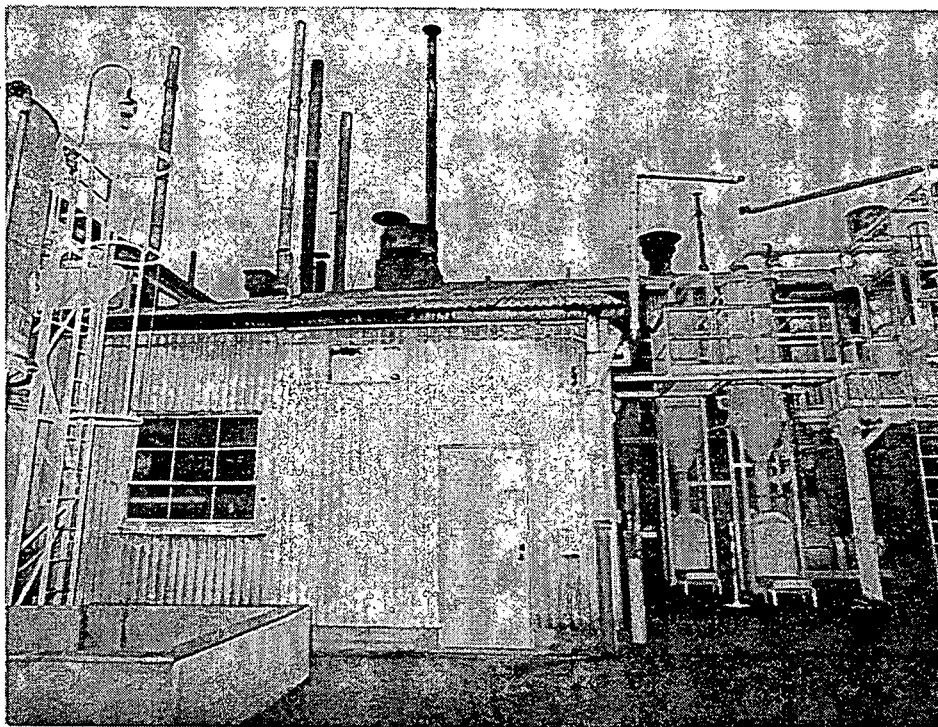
Building 9B - West Elevation, Sump Treatment Facility
